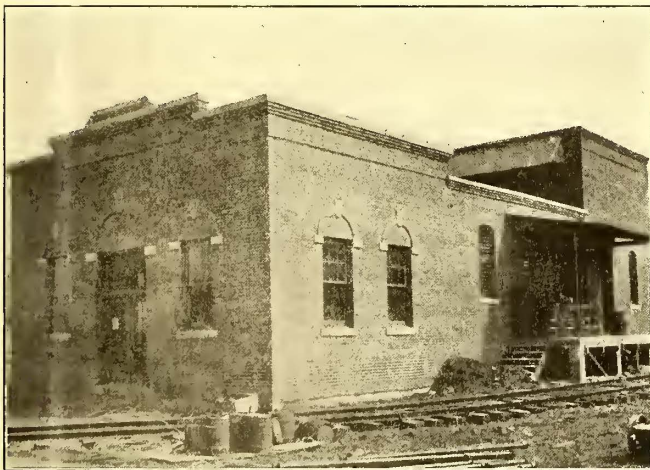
EXTERIOR OF DANVERS SUB-STATION, FREIGHT HOUSE AND WAITING ROOM
